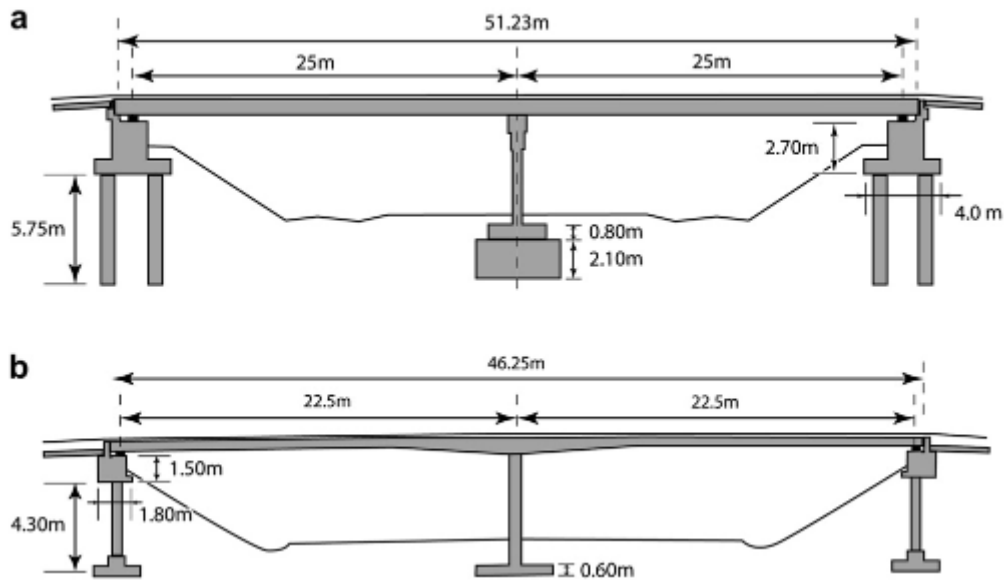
A) Bridge built with normal concrete, B) Bridge with UHPC [62]
